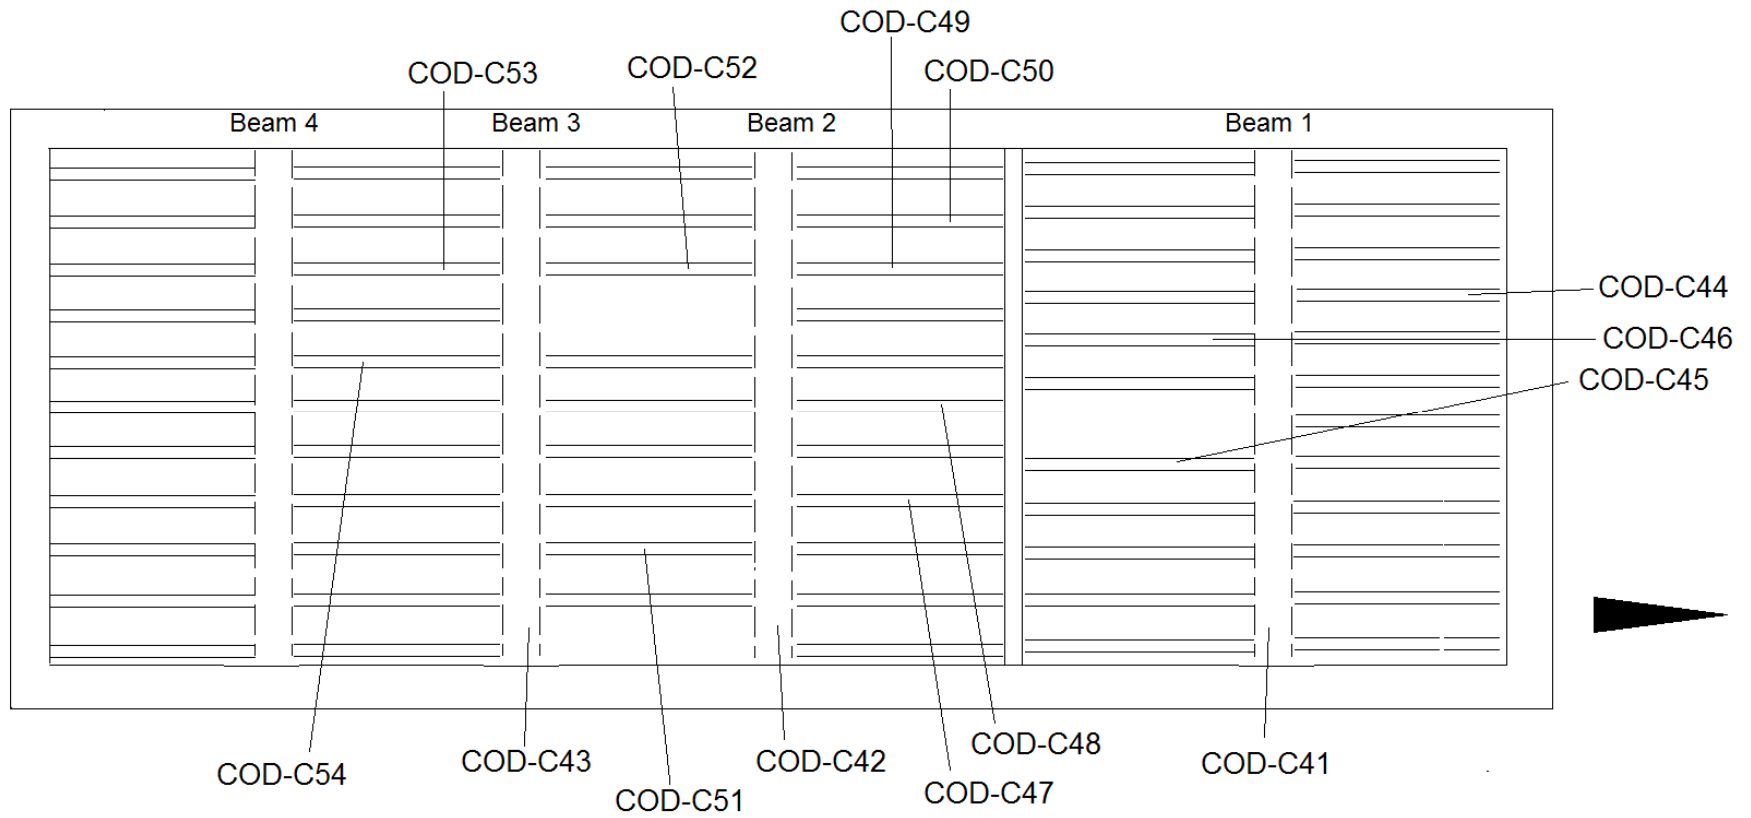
Sketch plan of the first-floor frame of the barn, showing the location of samples COD-C41–54
